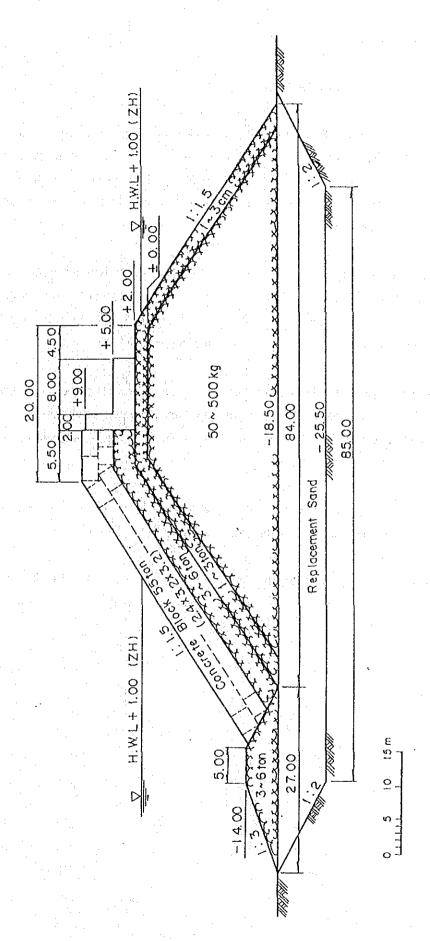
Typical Cross Section of North Main Breakwatter
